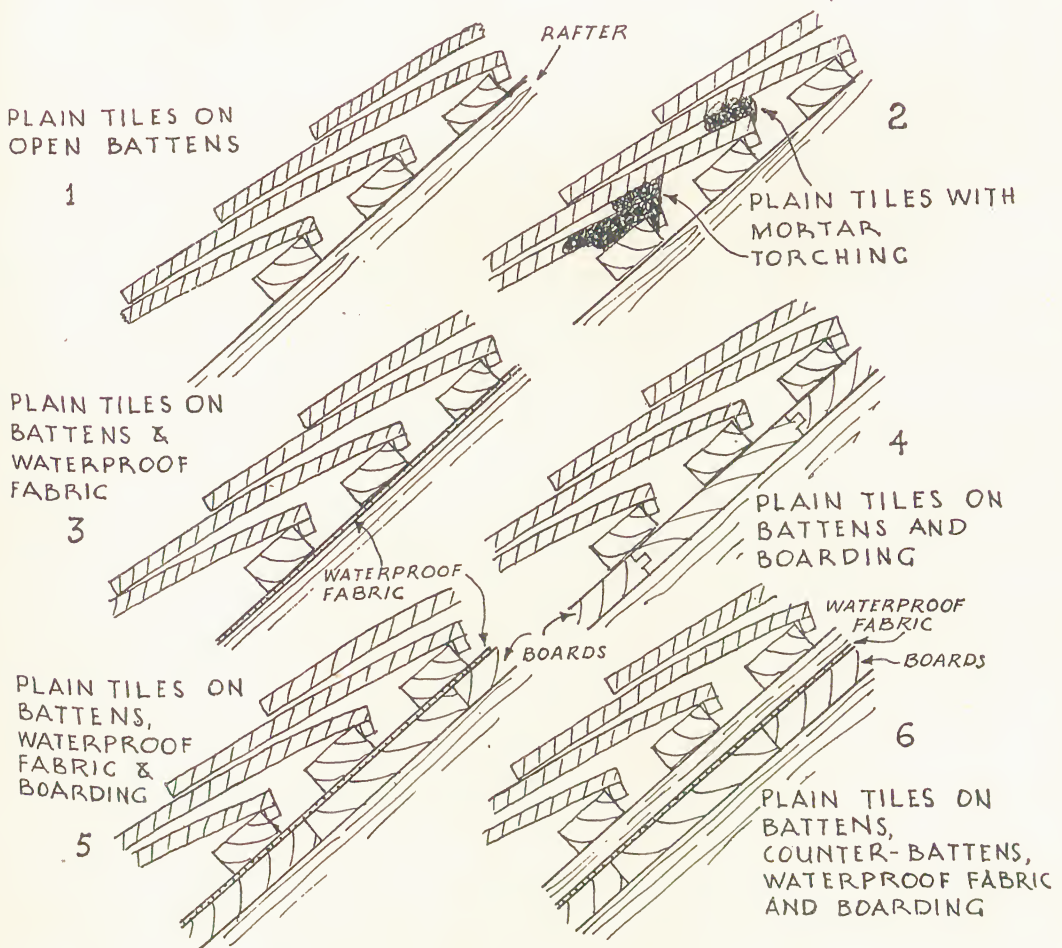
Various methods of sub-roofing to plain-tiled roofs.
